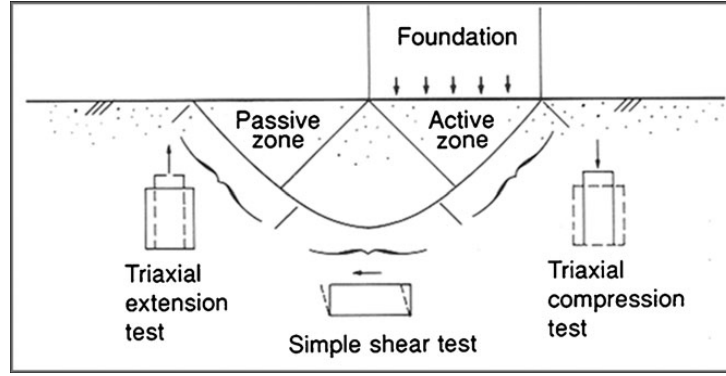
Proposed tests for assessment of undrained strength and strain anisotropy along the failure surface under a foundation (Grimstad et al. (2012))
